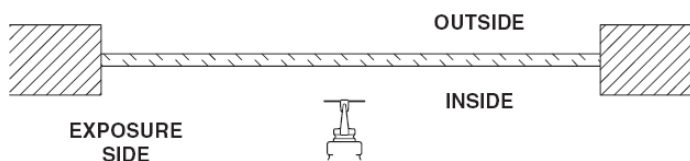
A-2 — EXTERIOR FIRE SEPARATION — SPRINKLERS INSIDE
